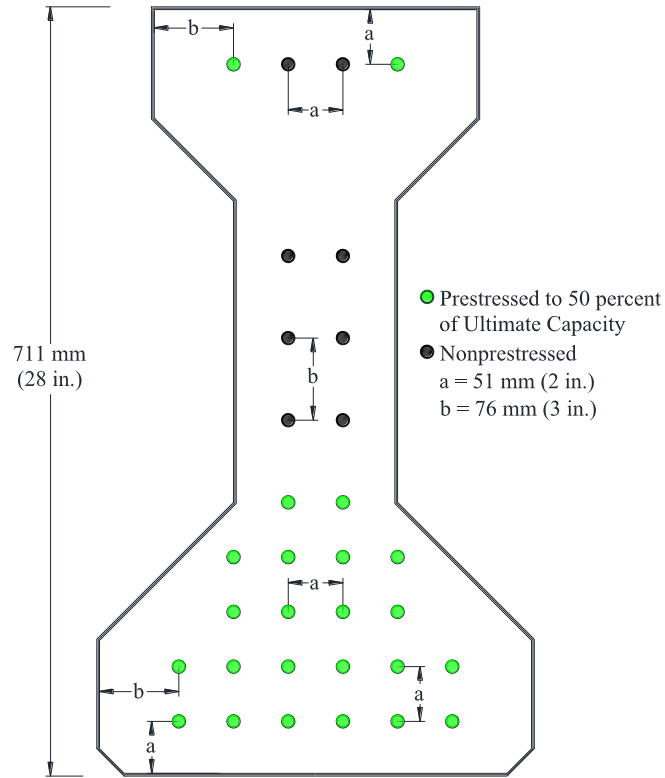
Prestressing Layout of the Control Specimen (AASHTO I-girder Type I).
